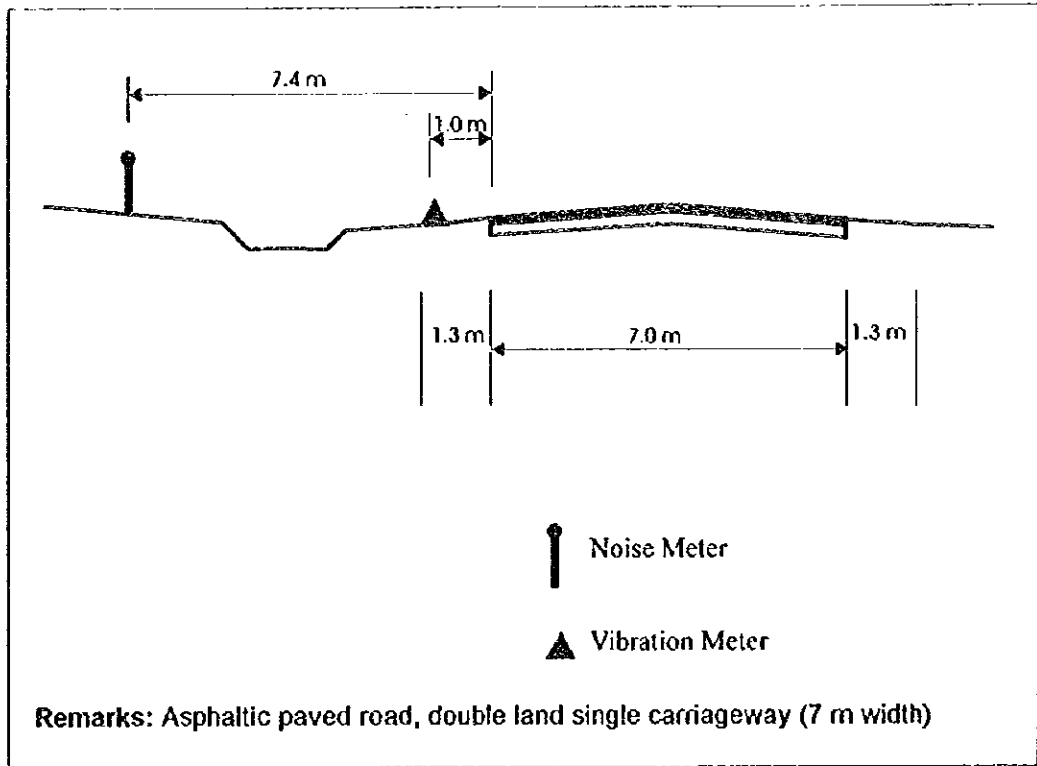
Road profile at station A1 along New Bagamoyo Road about 150 m north of the intersection with Sam Nujoma Road
